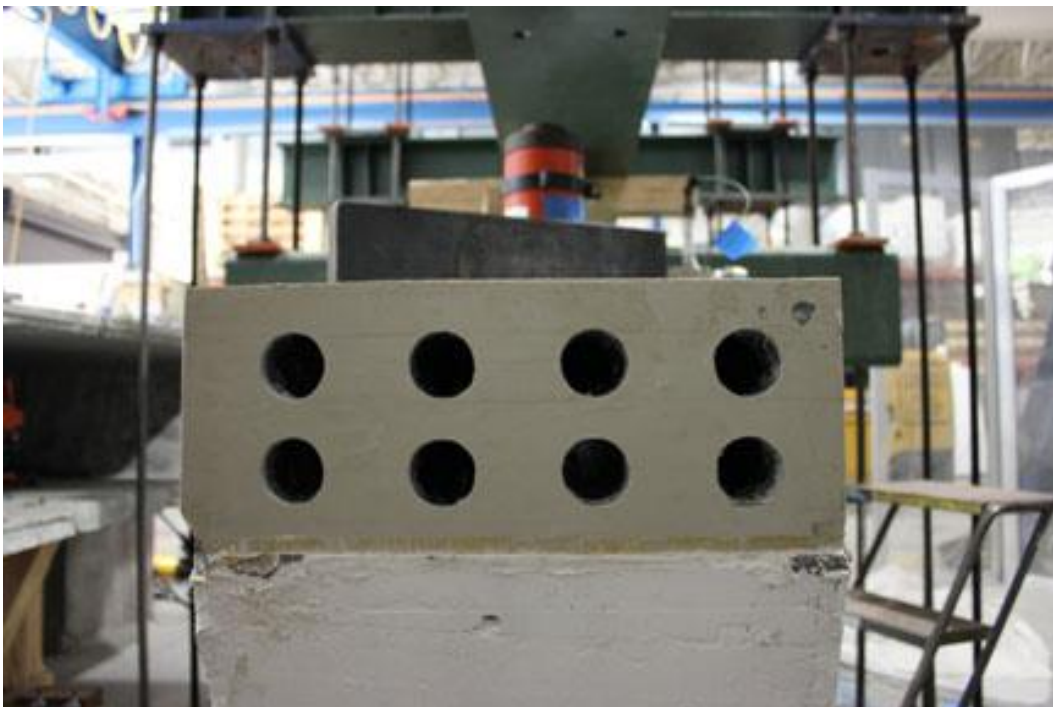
Anchorage Zone Recasting Using Sikadur 32 Hi-Mod Epoxy
